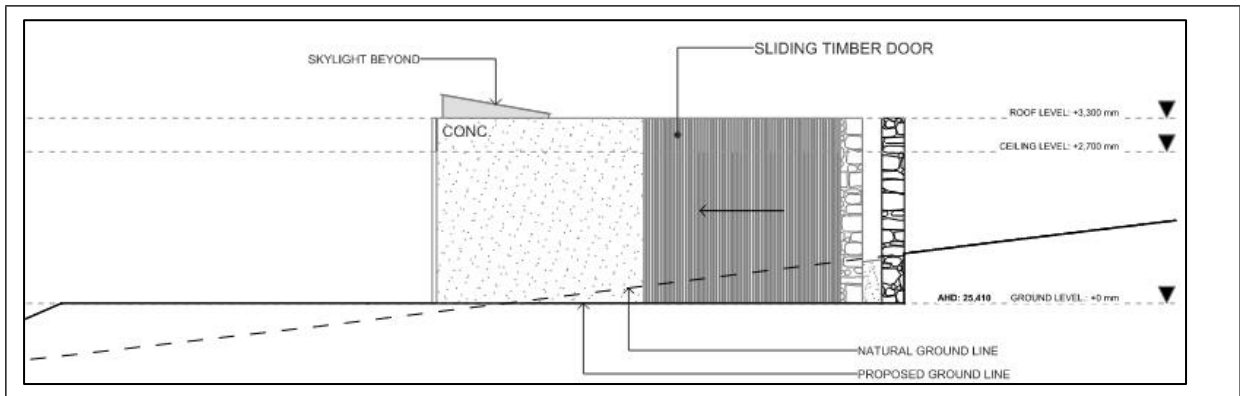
Proposal Plans – Southern Elevations – Workshop & Retaining Wall
